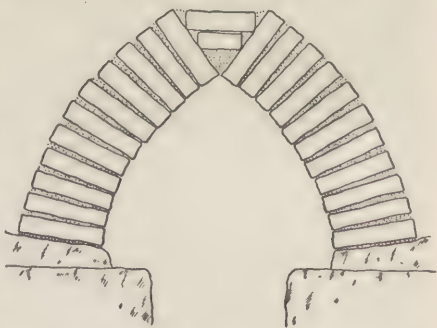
Ancient Assyrian Pointed Arch over Drain.
